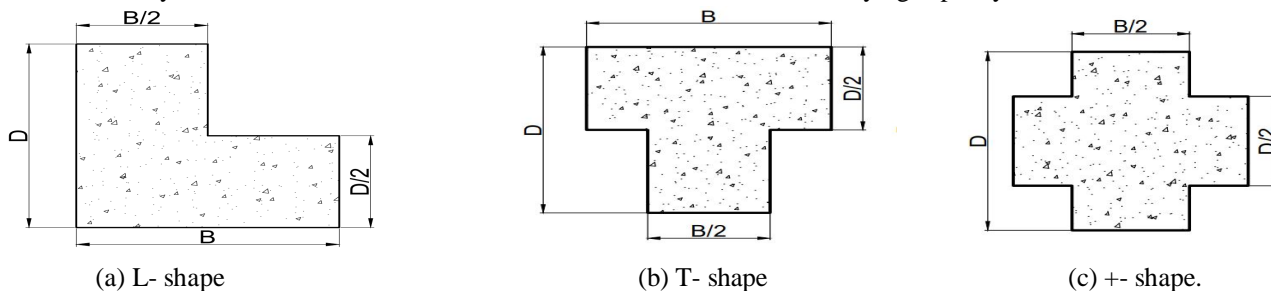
Section models (a) L- shape (b) T- shape (c) +- shape.
